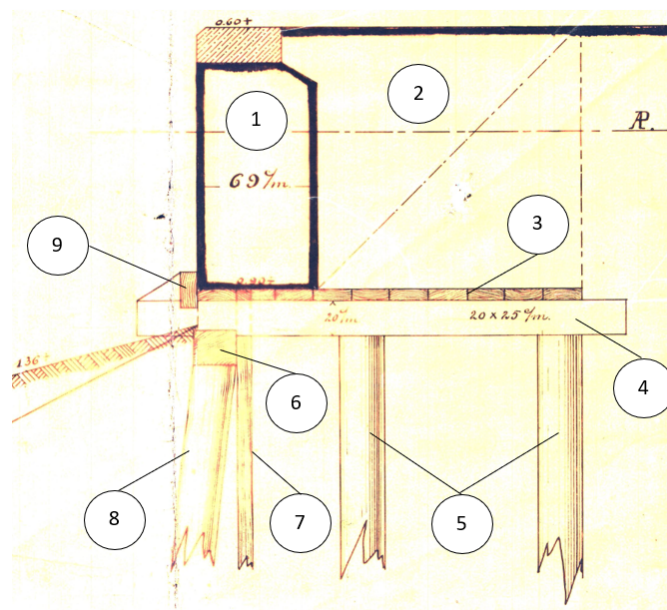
Typical quay wall in Amsterdam.(Movares, 2019)
